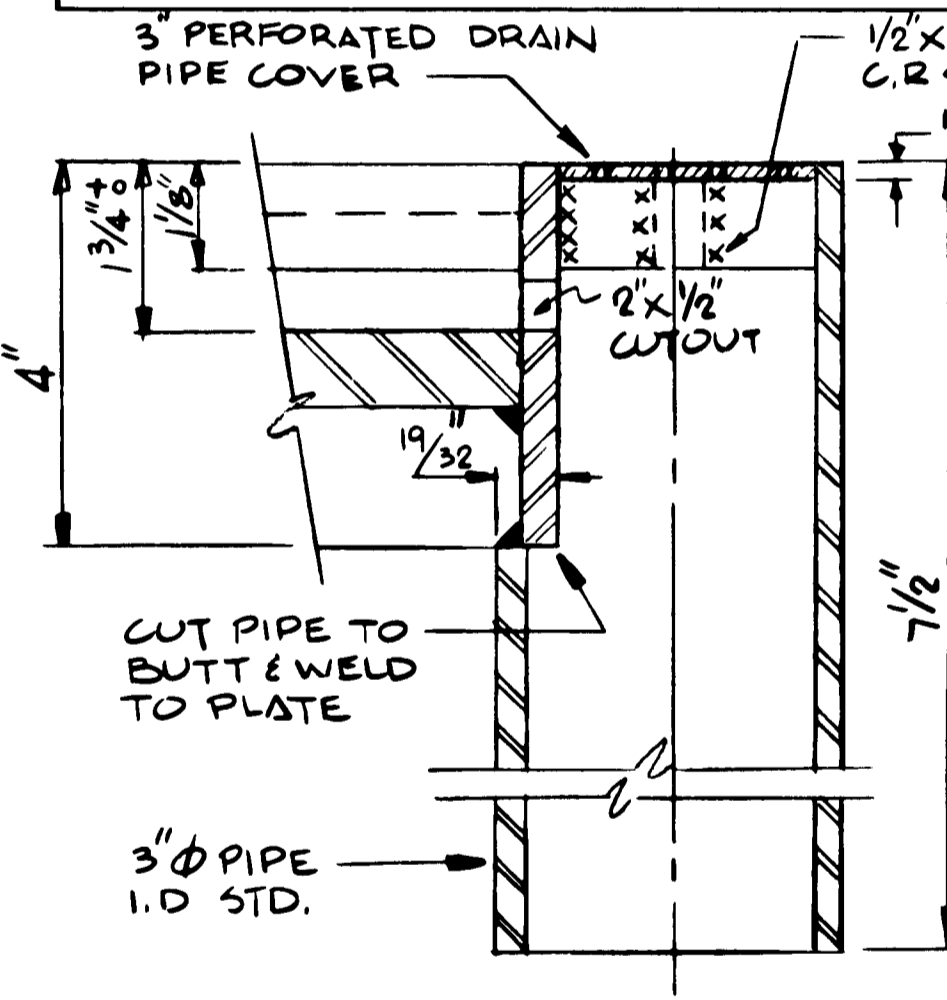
/4" PLATE AFTER WELDING
